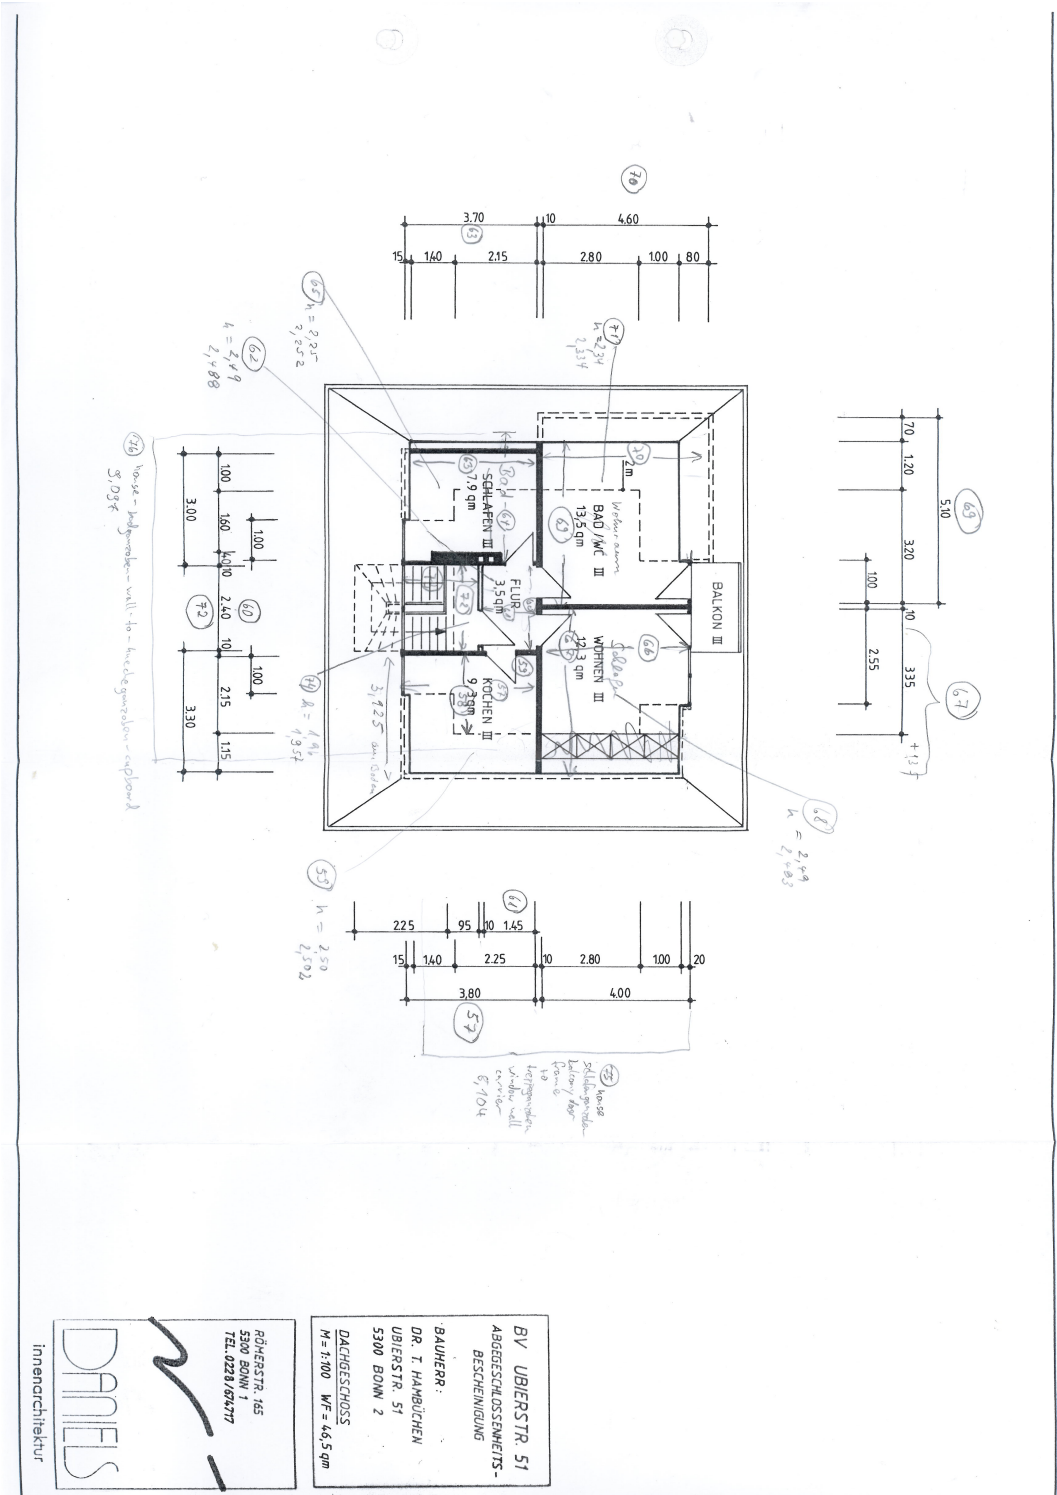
Floor plan of the top floor of the Uberhouse.
